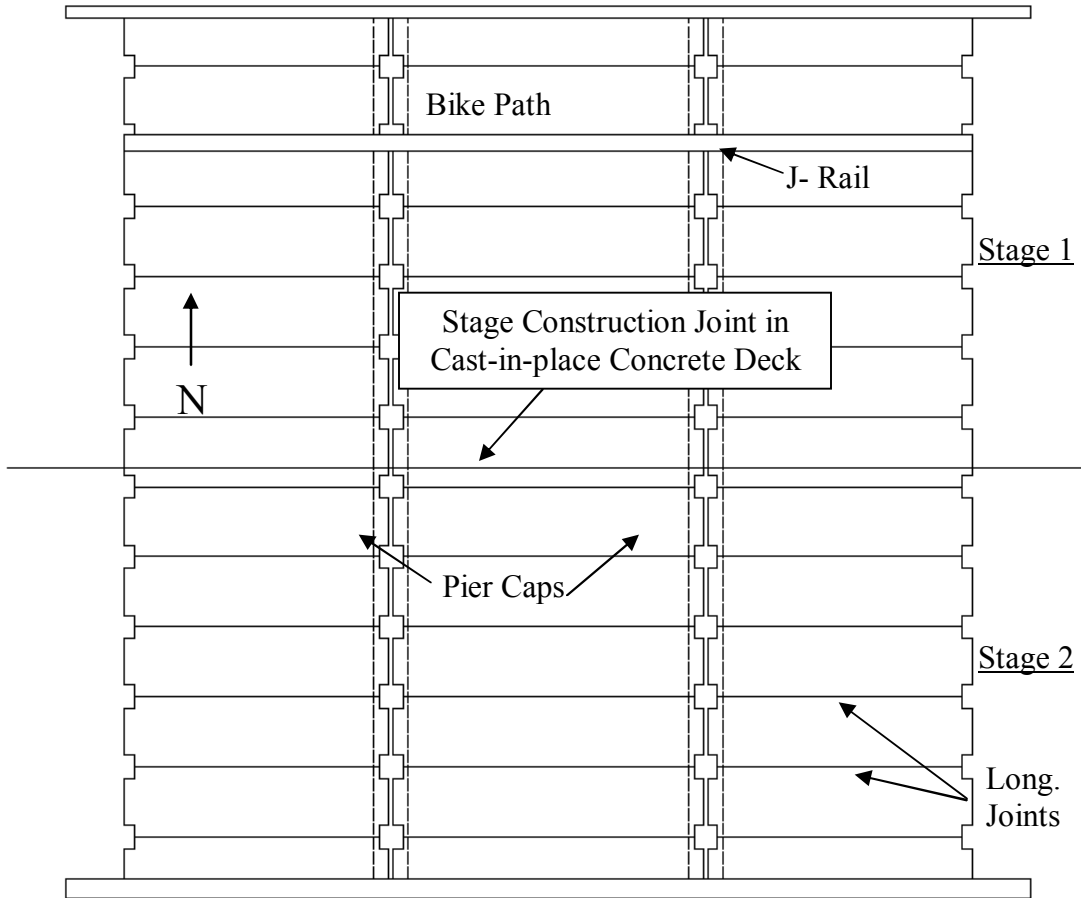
Plan view of Mn/DOT Bridge No. 13004 with construction stages and construction joint highlighted
